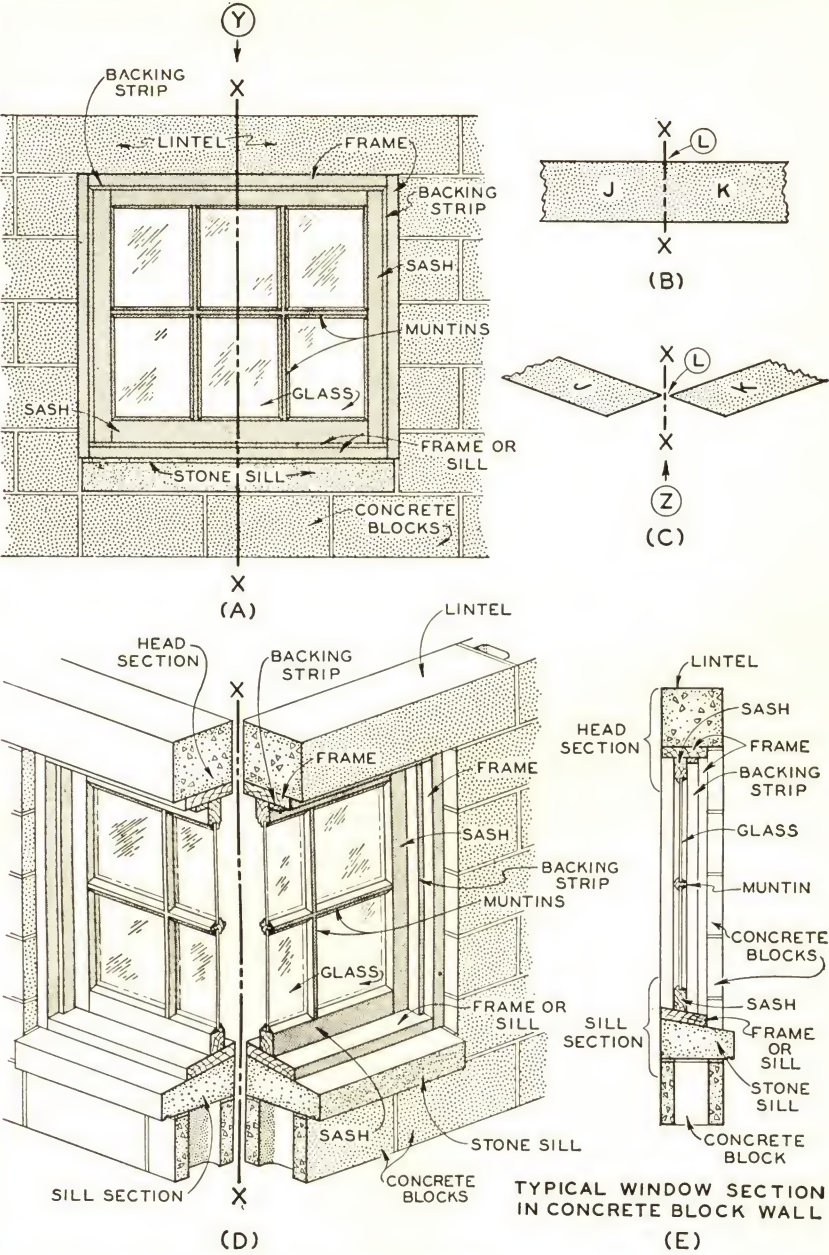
How to Visualize the Section View of a Window in a Concrete Block Wall
